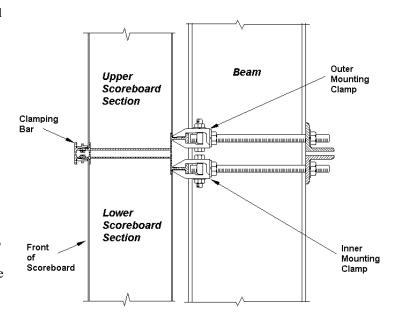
Multi-Section Scoreboard Mounting (Side View)
